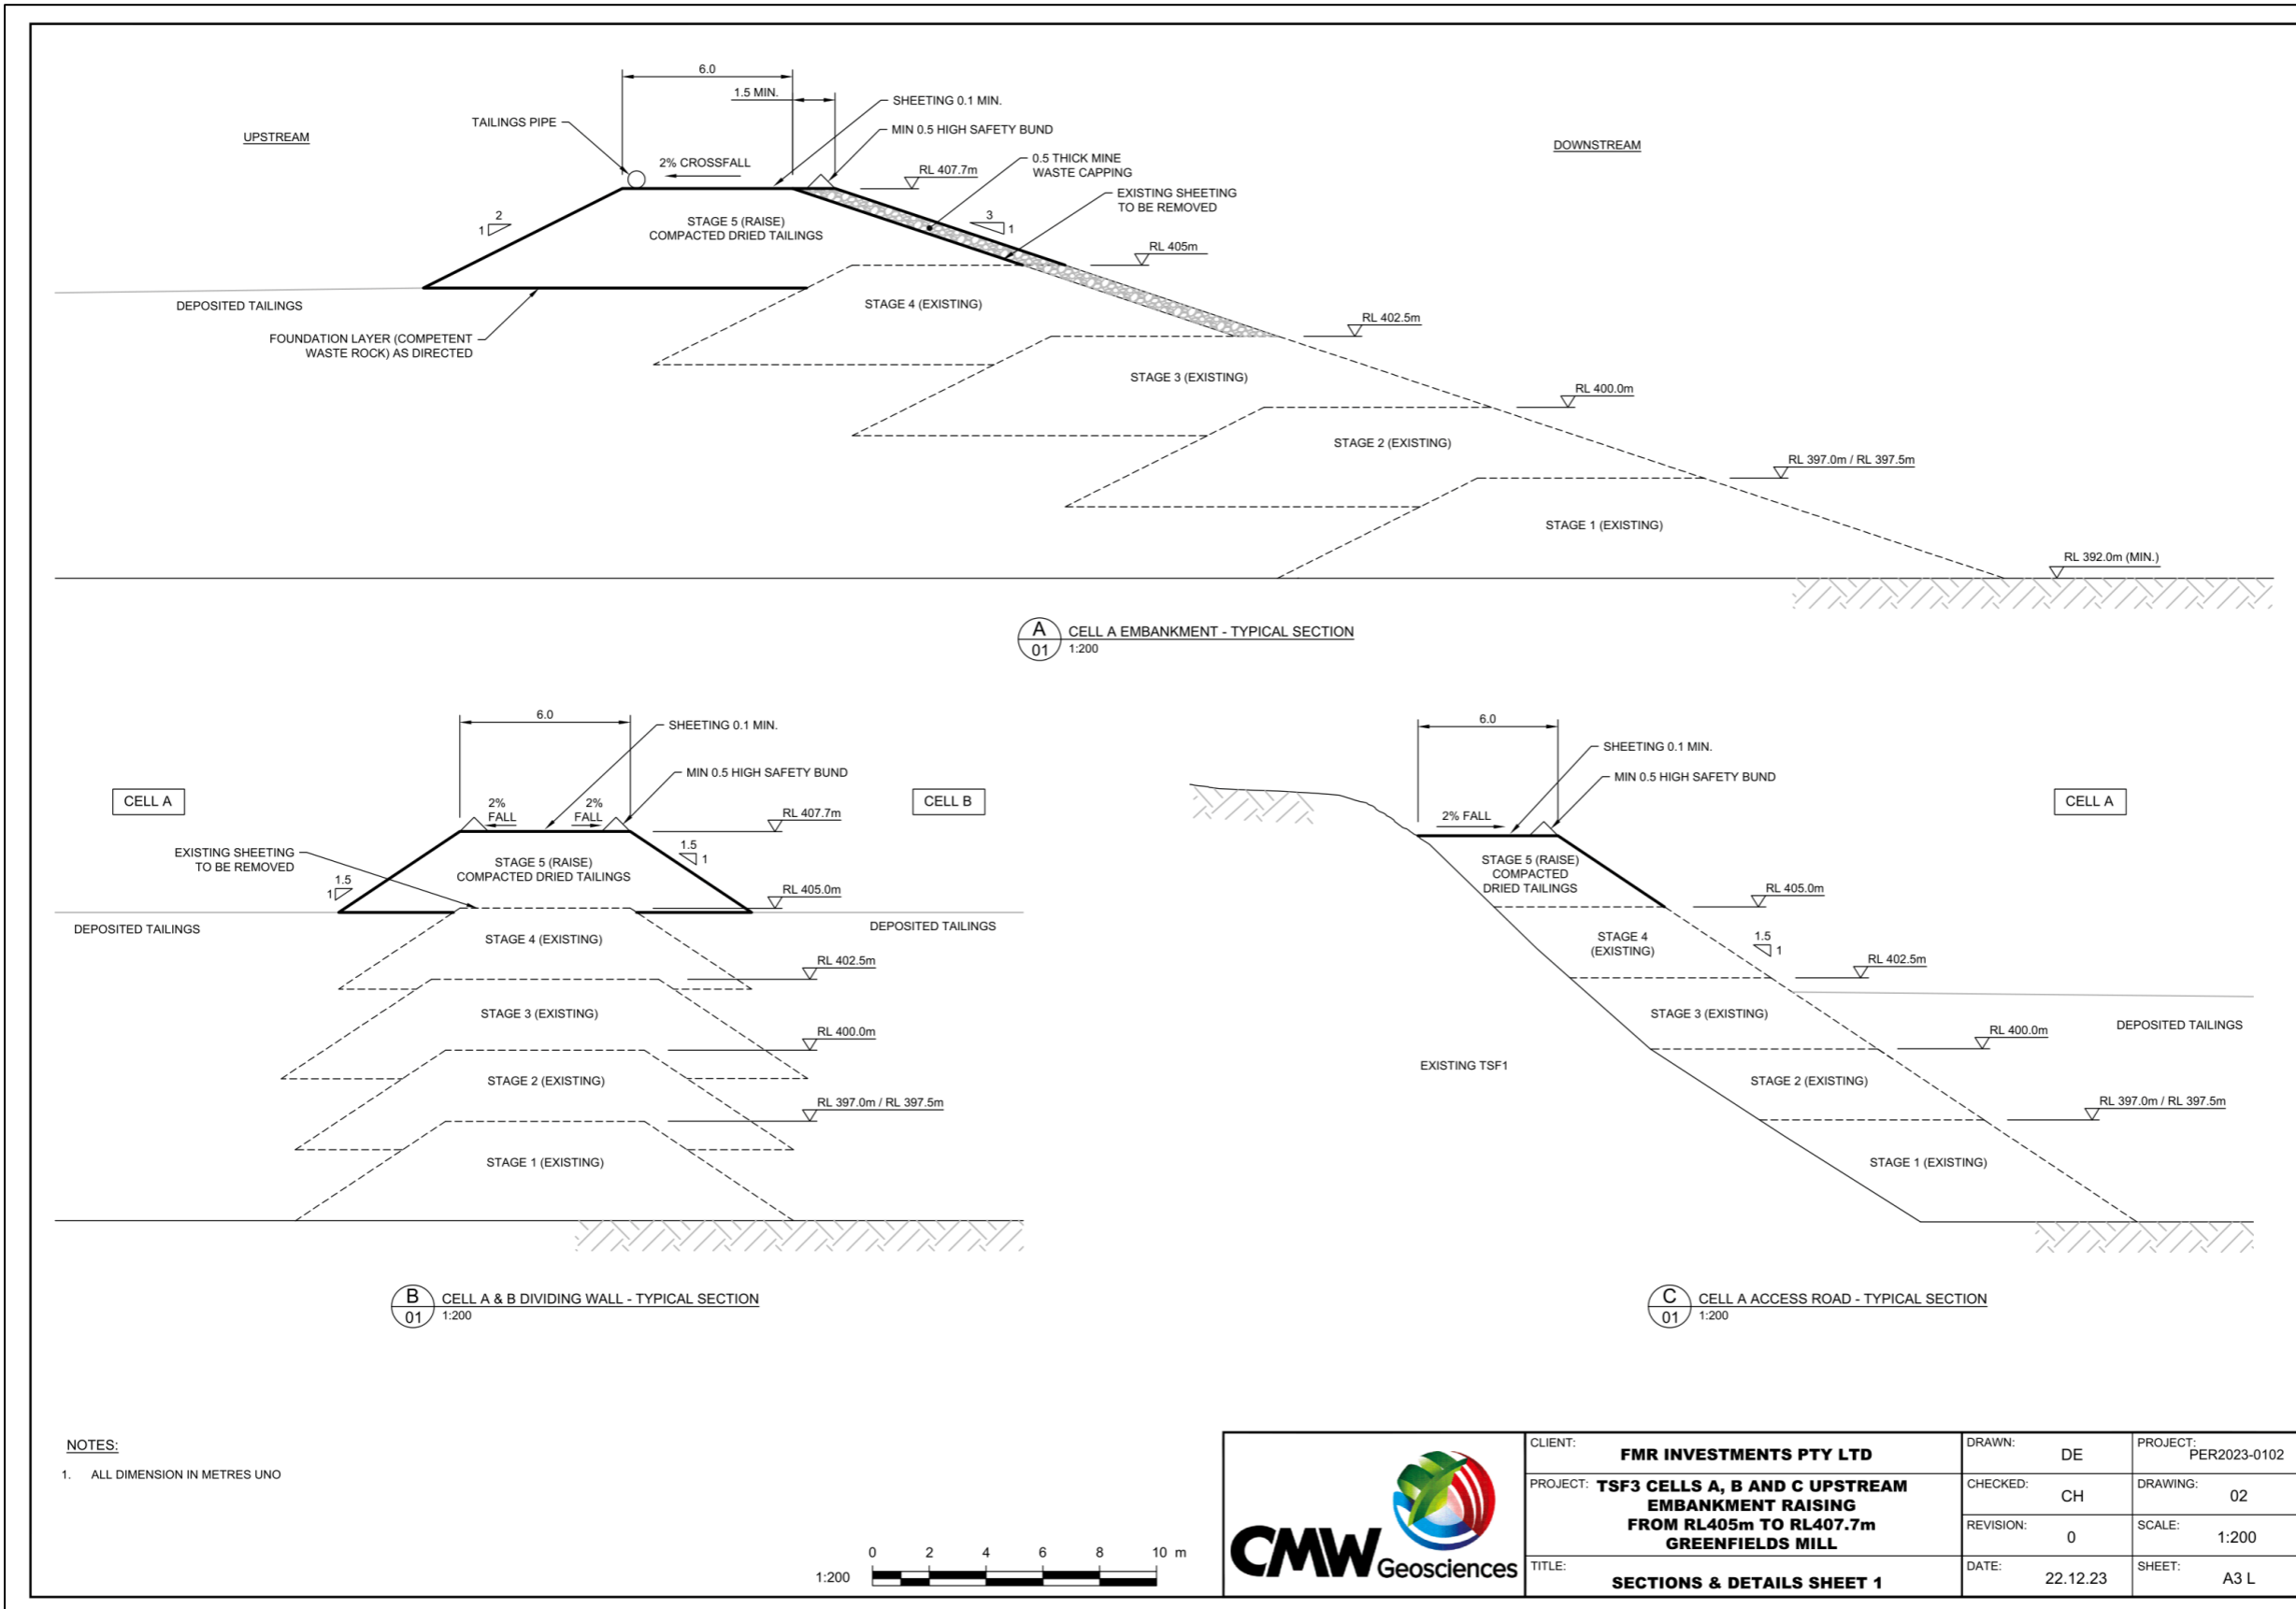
Design drawing (cross-section) for TSF3 Cell A Stage 5 embankment raise
